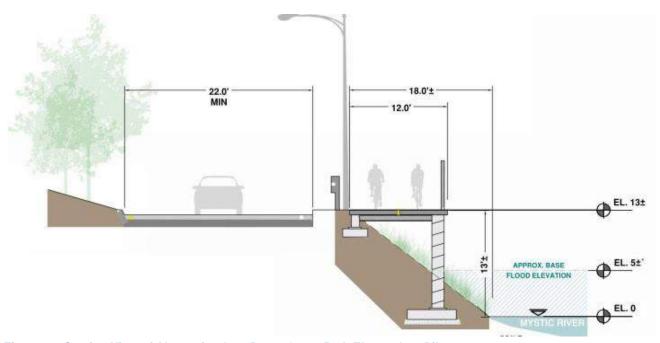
Section View of Alternative A2 - Ramp Open, Path Elevated on Piles
